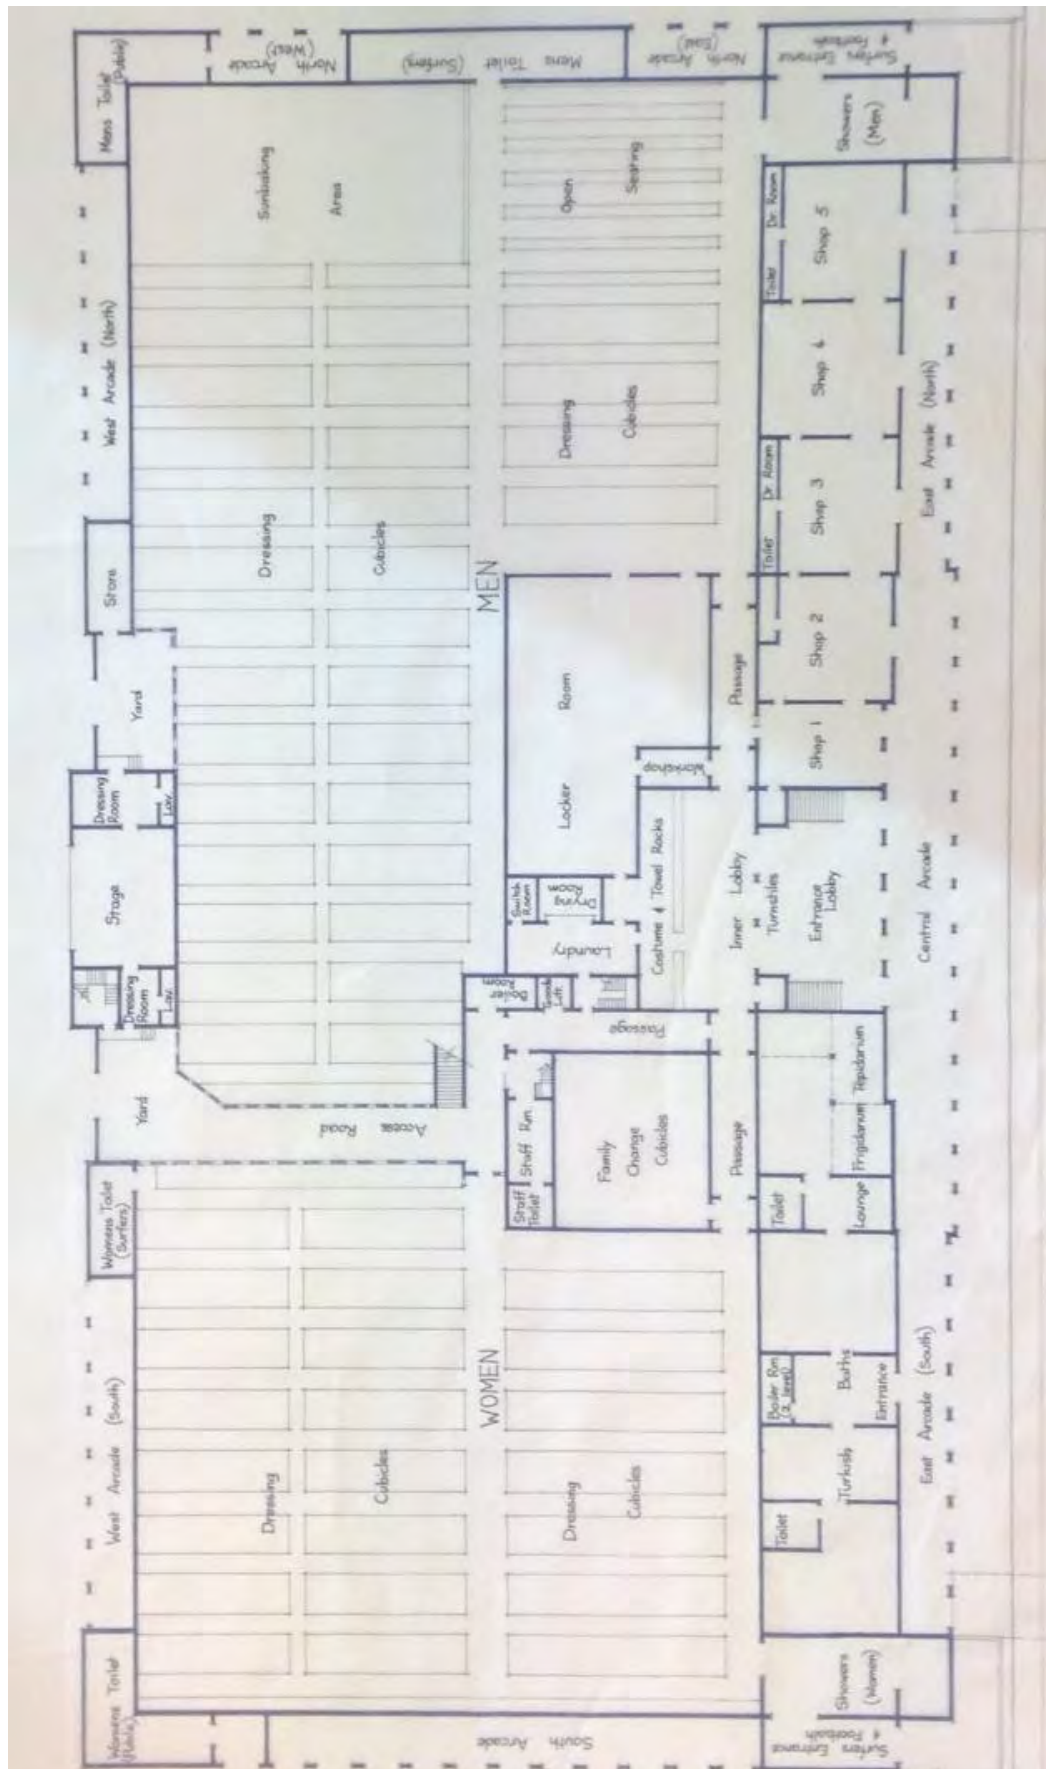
Reconstruction of the Bondi Pavilion's ground floor, showing the stage and changing facilities associated with the 1931 modifications rather the original layout of the building.
